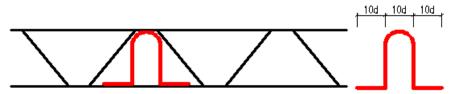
Auxiliary hoist lifting lugs reinforcement 图 13. 副吊吊攀加固
